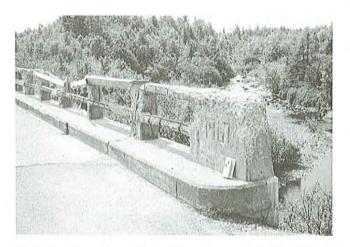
Premature deterioration of concrete bridge, Norris Arm, central Newfoundland.
